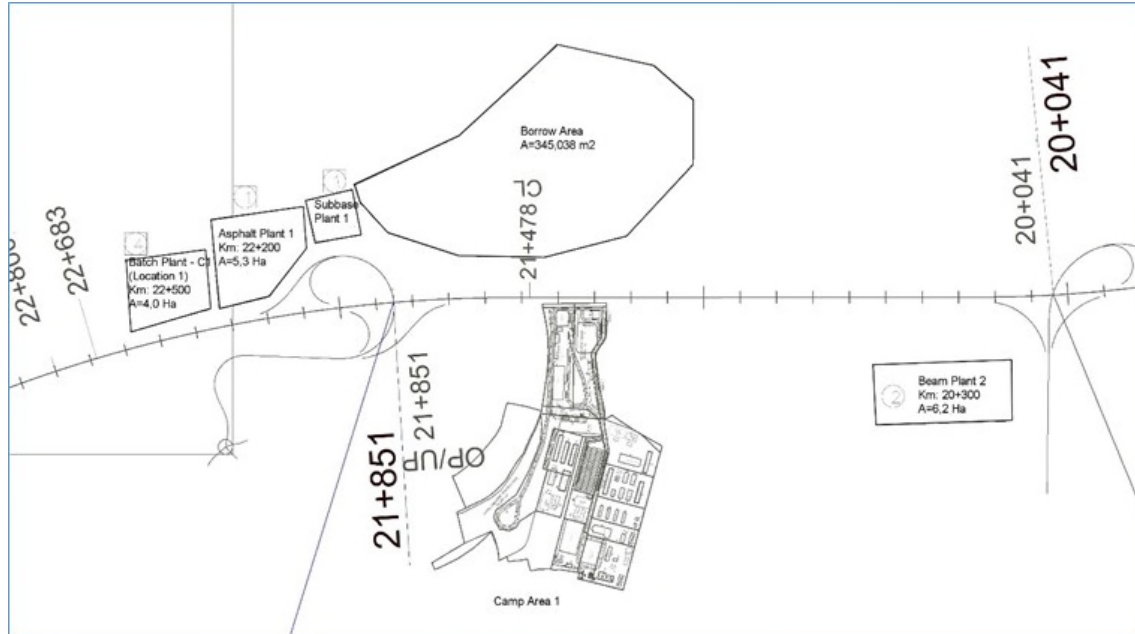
Batch Plant-1, Asphalt Plant-1, Beam Plant-2 and Subbase Plant-1
